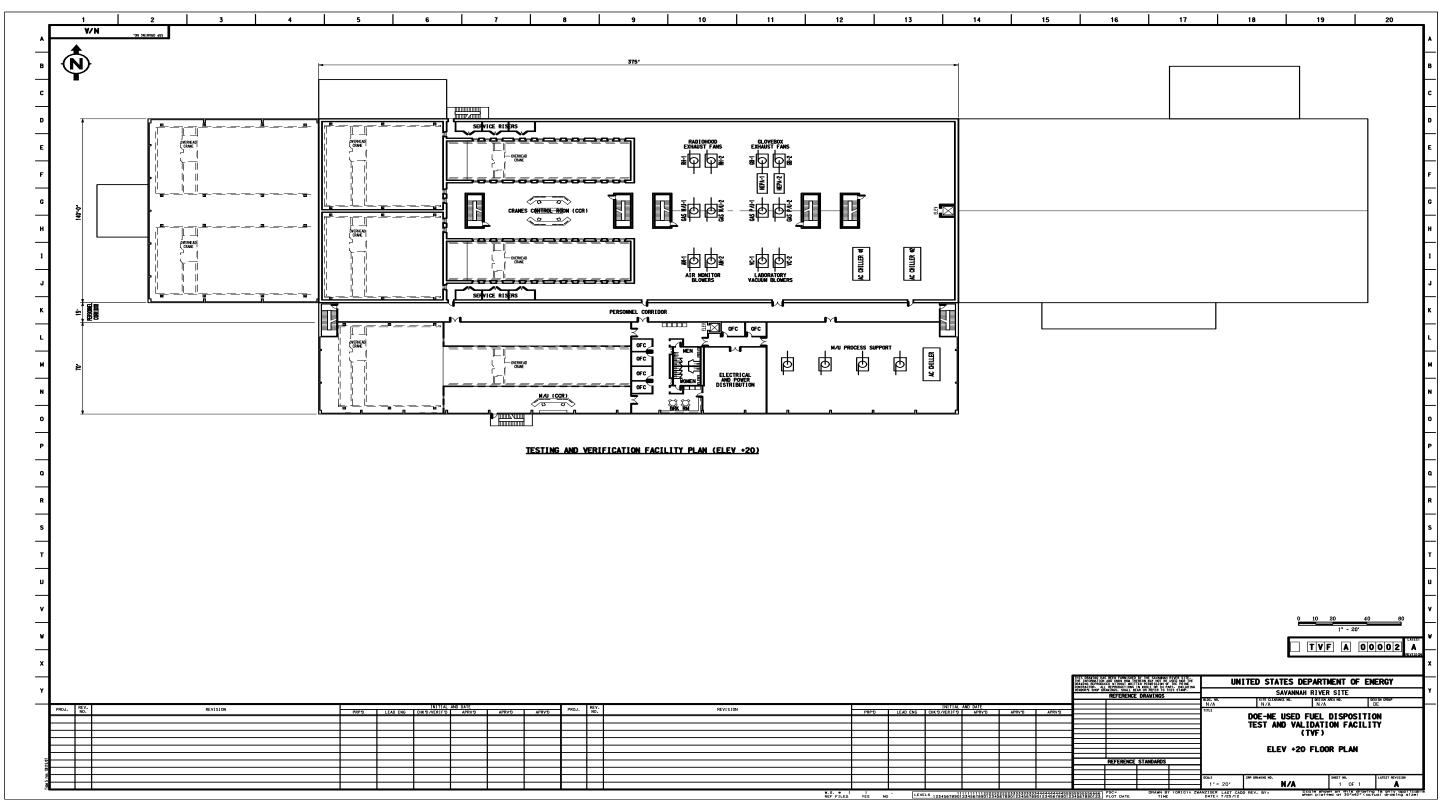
Test and Validation Facility Elevation + 20 Feet
